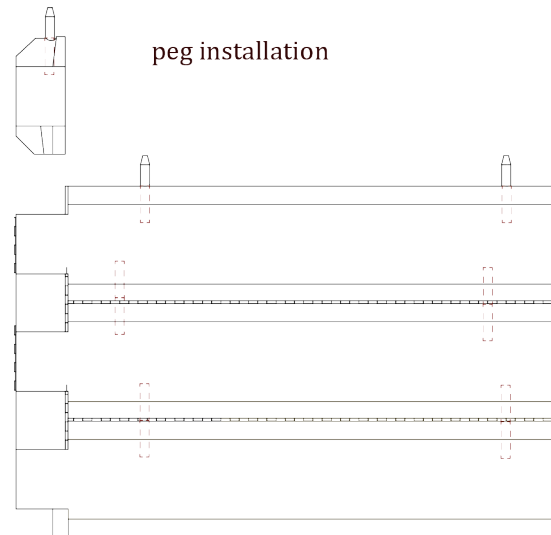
Peg installation (source: Studio 51 - biuro architektoniczne)
